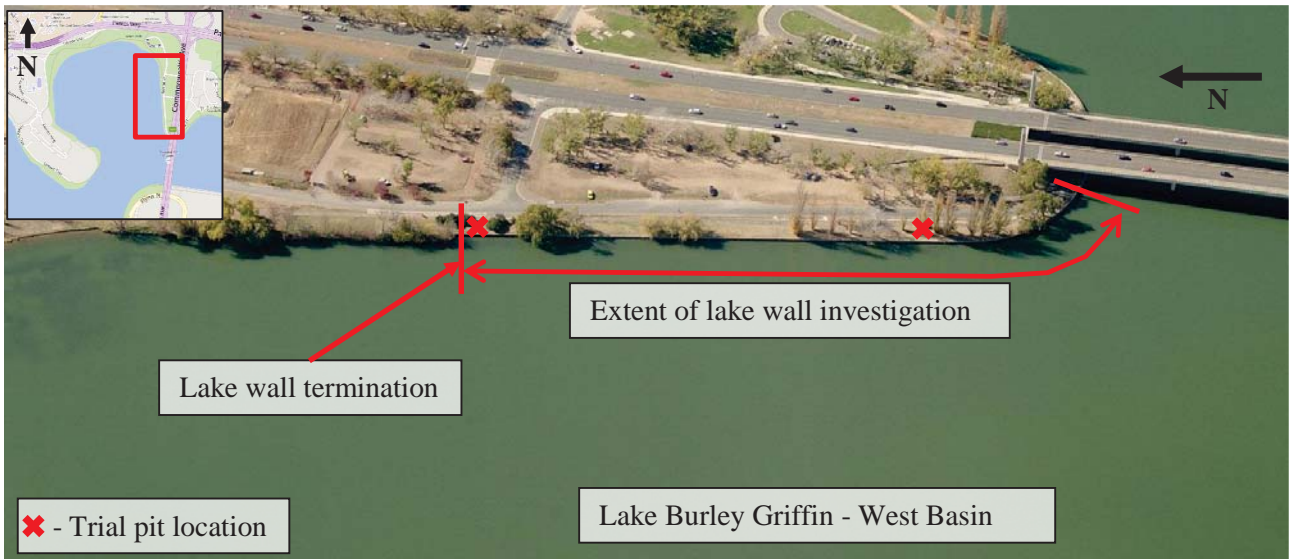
Locality plan & extent of lake wall investigation plan and trial pit location
